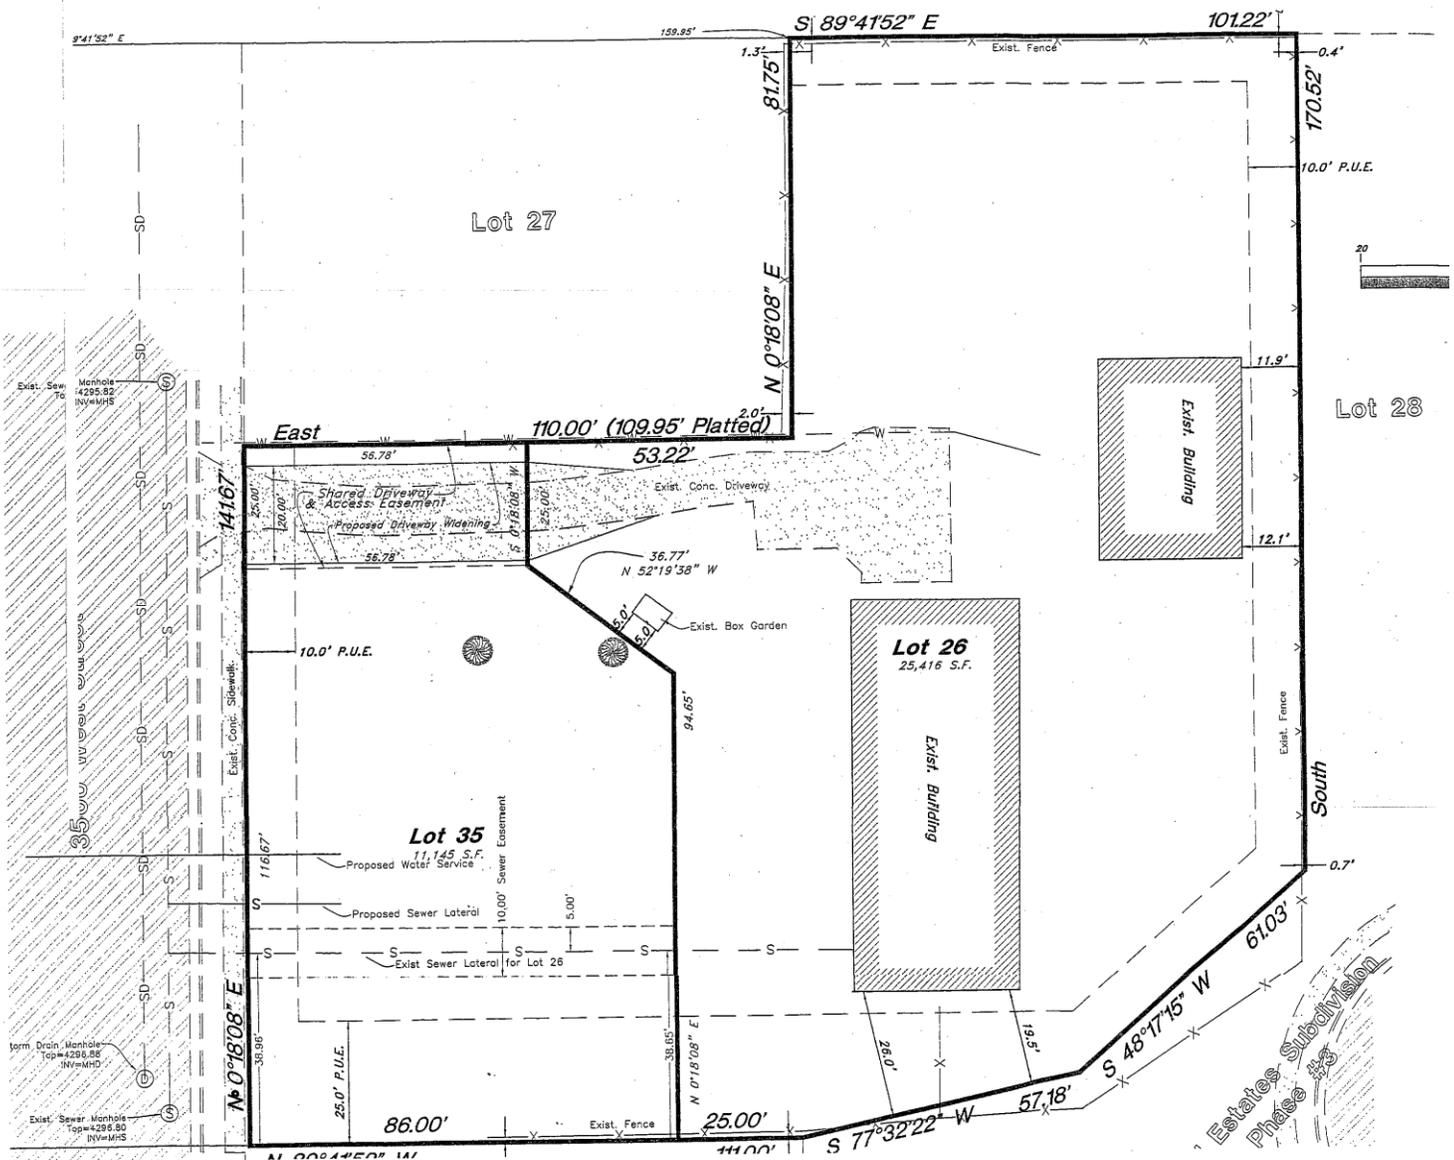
EXHIBIT "B" – PRELIMINARY SUBDIVISION PLAT
